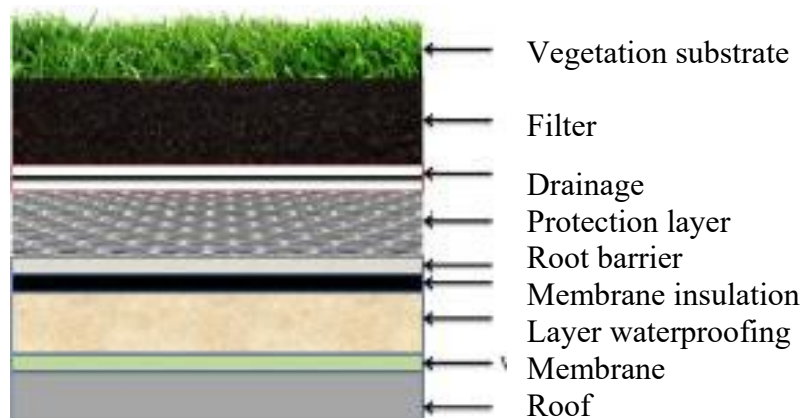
Typical component of green roof (Shafique et al., 2018)
